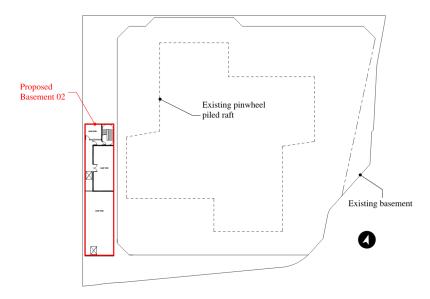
Proposed Basement 02 plan (extract from 3XN drawing no.: ET_DR-A_20098)
